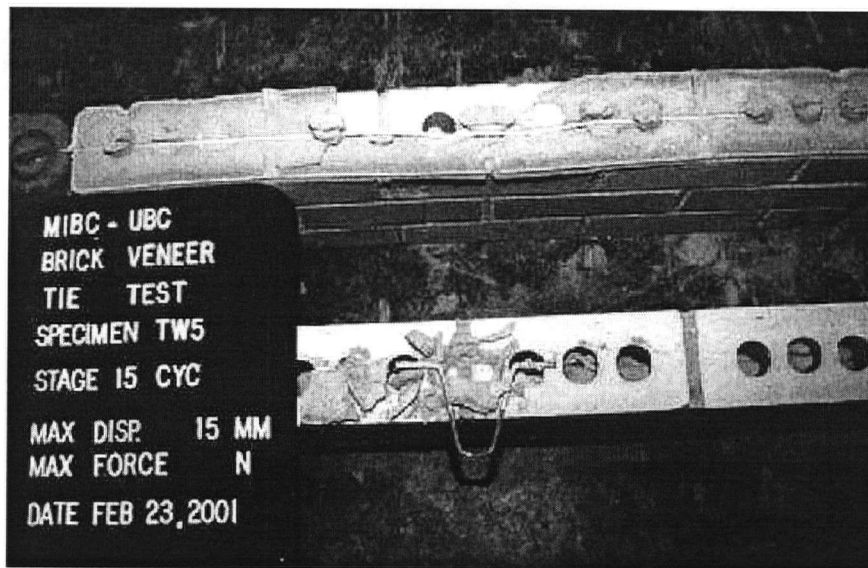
Photograph of a failed specimen with tie and horizontal joint reinforcement no-clips, showing the deflected wire and tie.
